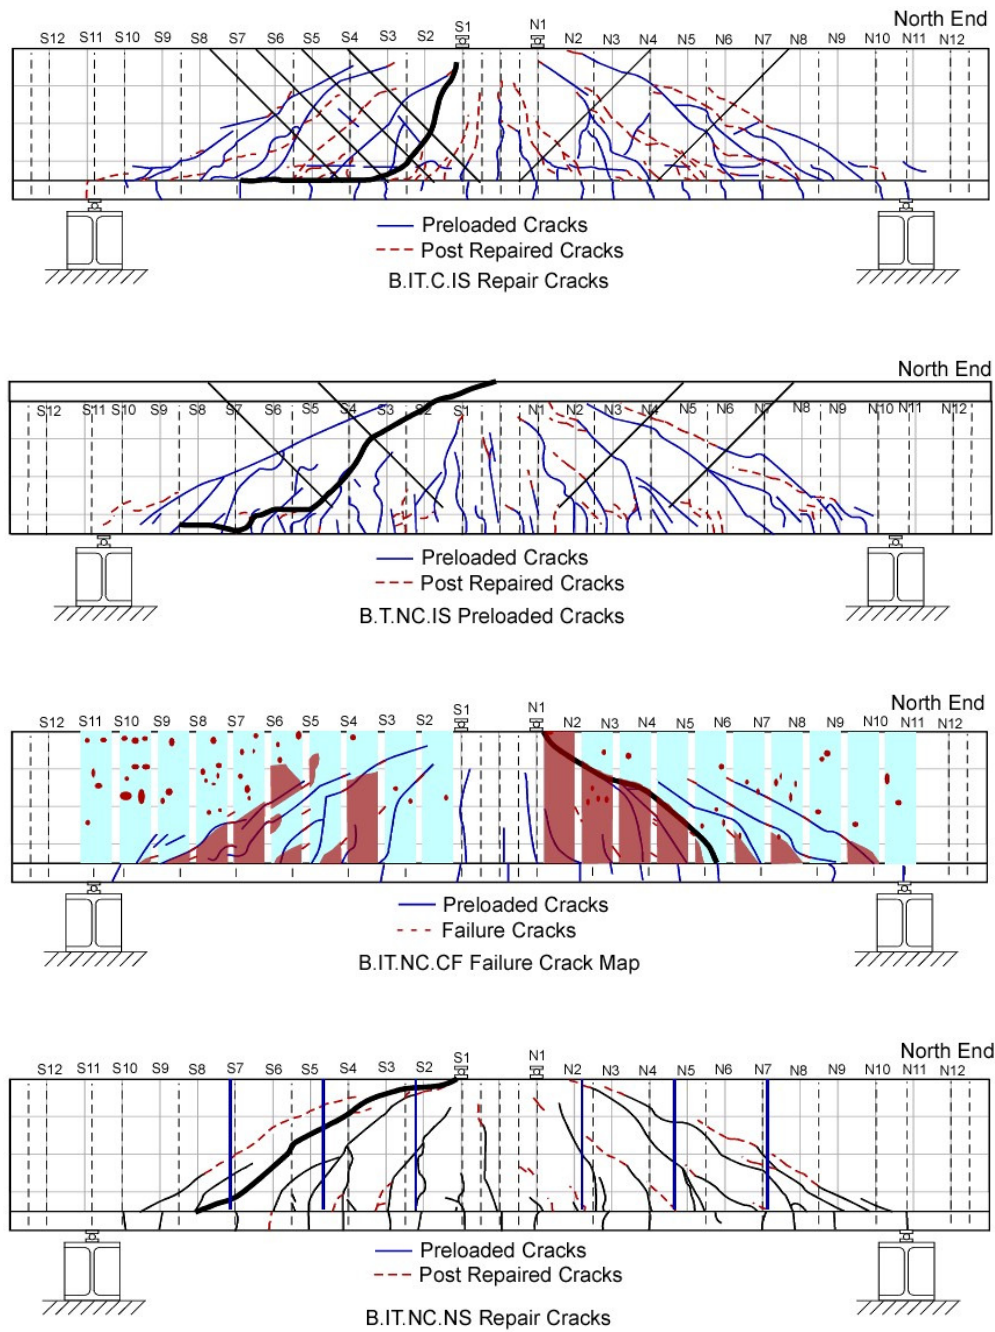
Beam specimen crack maps: precrack versus repair continued
